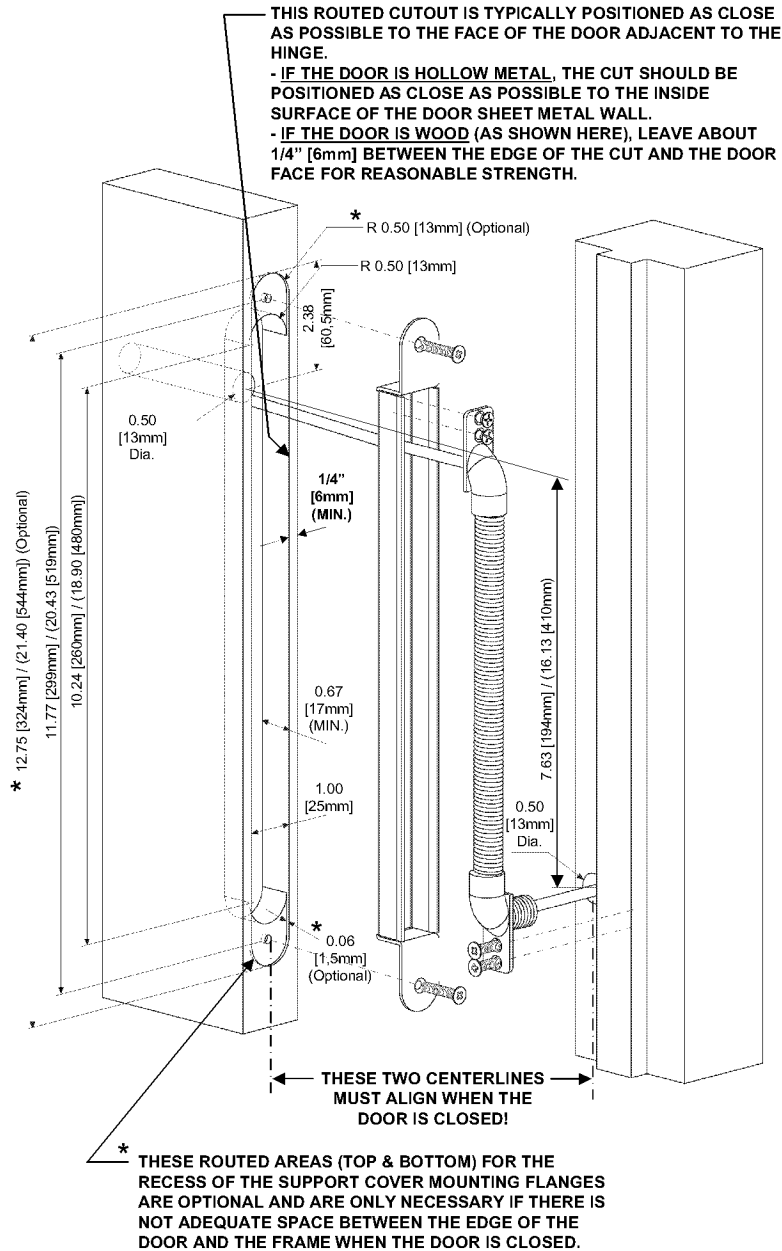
EXPLODED ASSEMBLY VIEW OF EPT & EPTL
